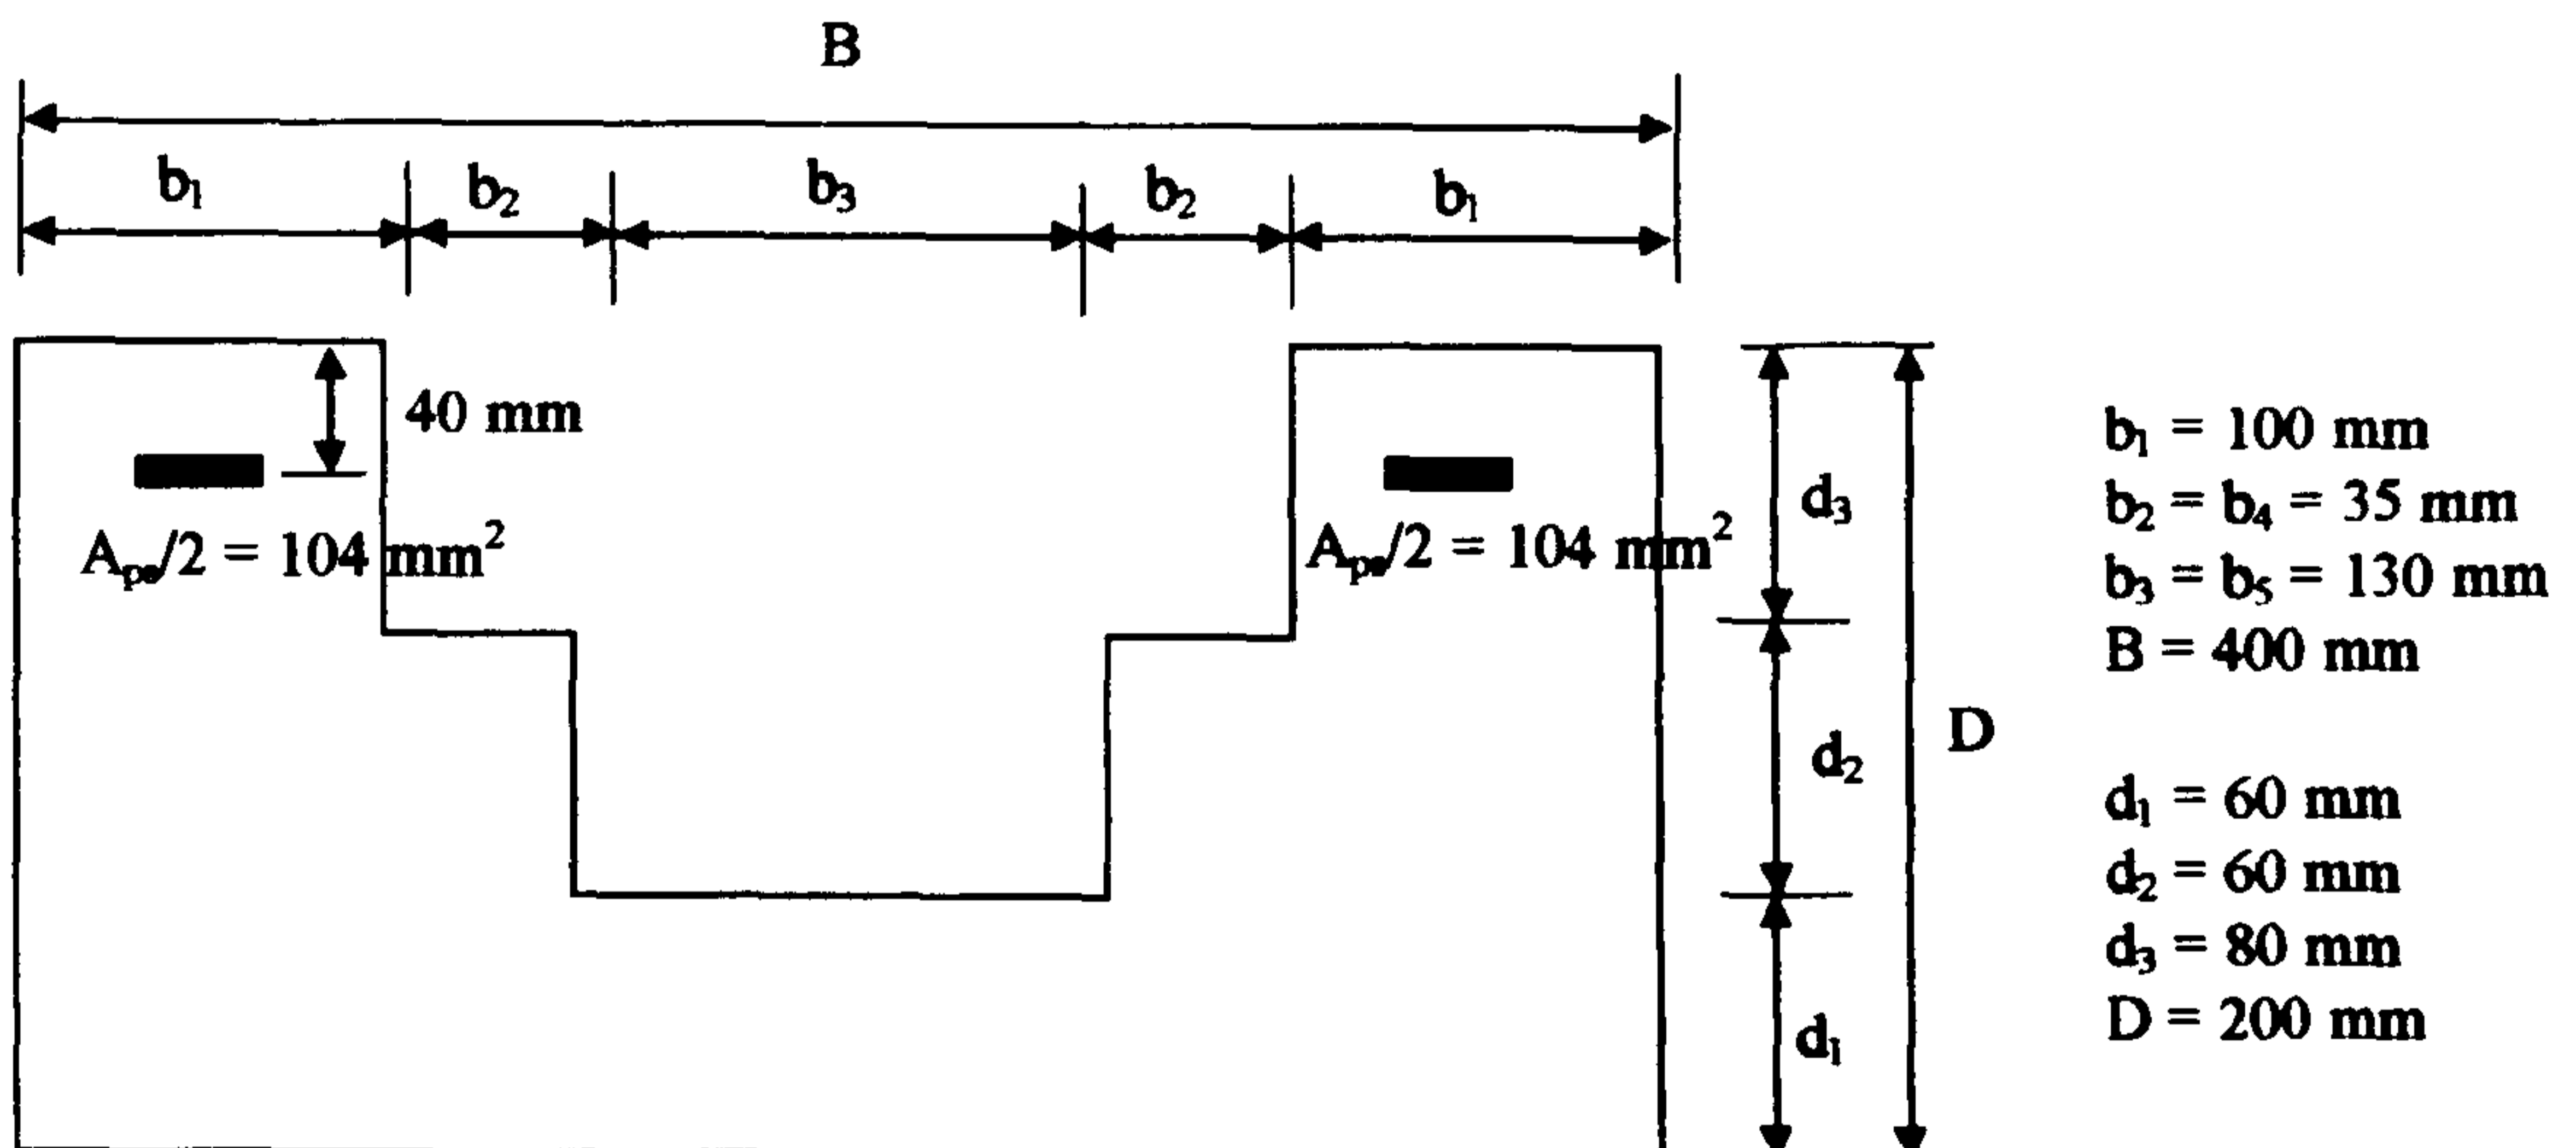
Concrete trough cross-sectional properties for example 2.
